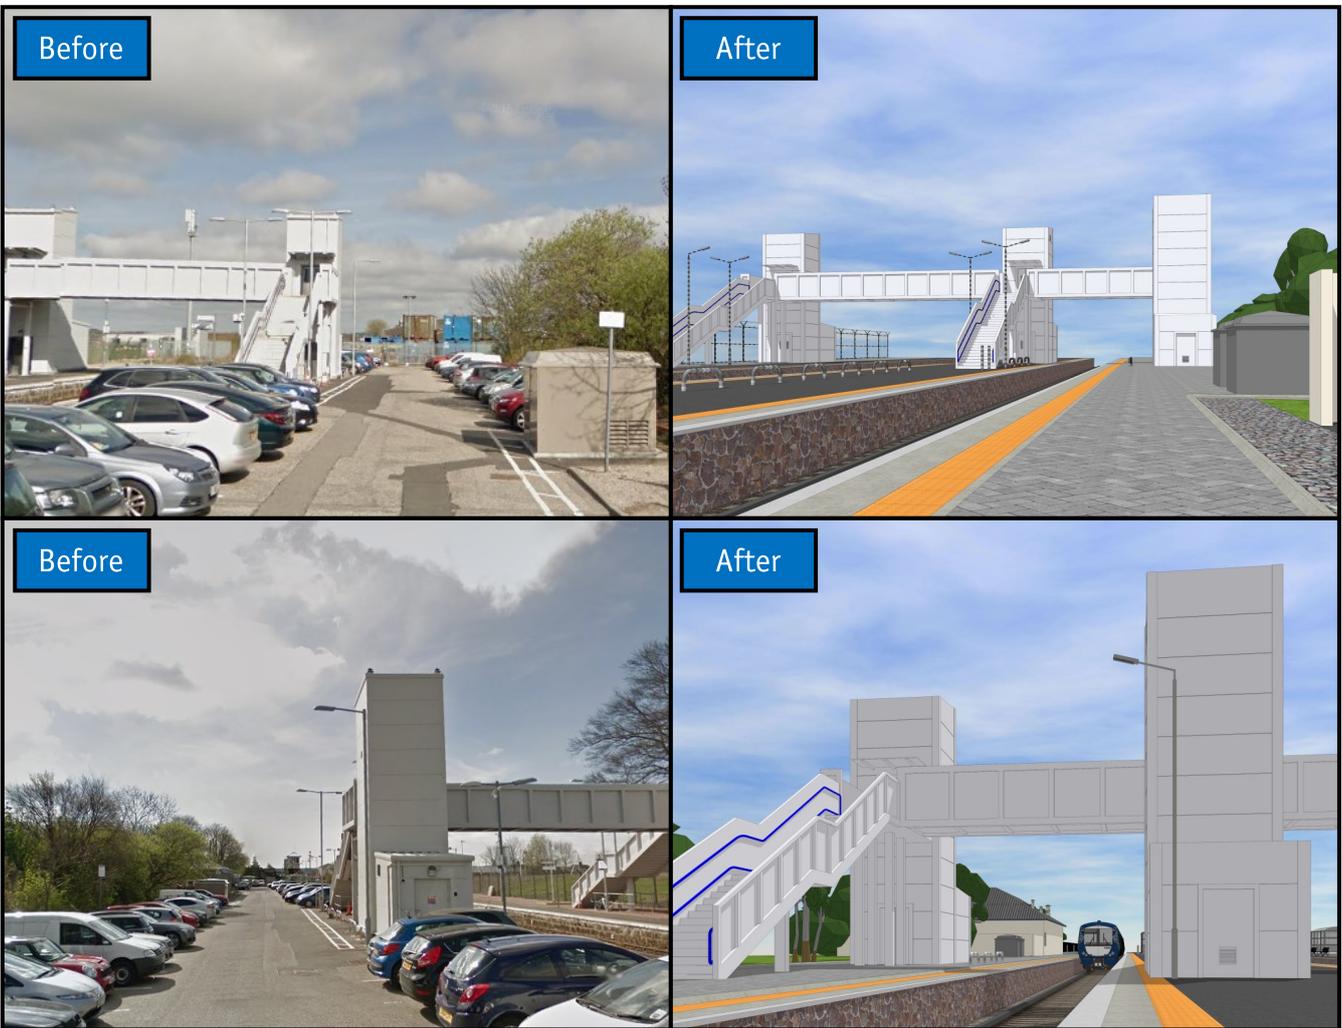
New Footbridge Access to Platforms from Car Park
